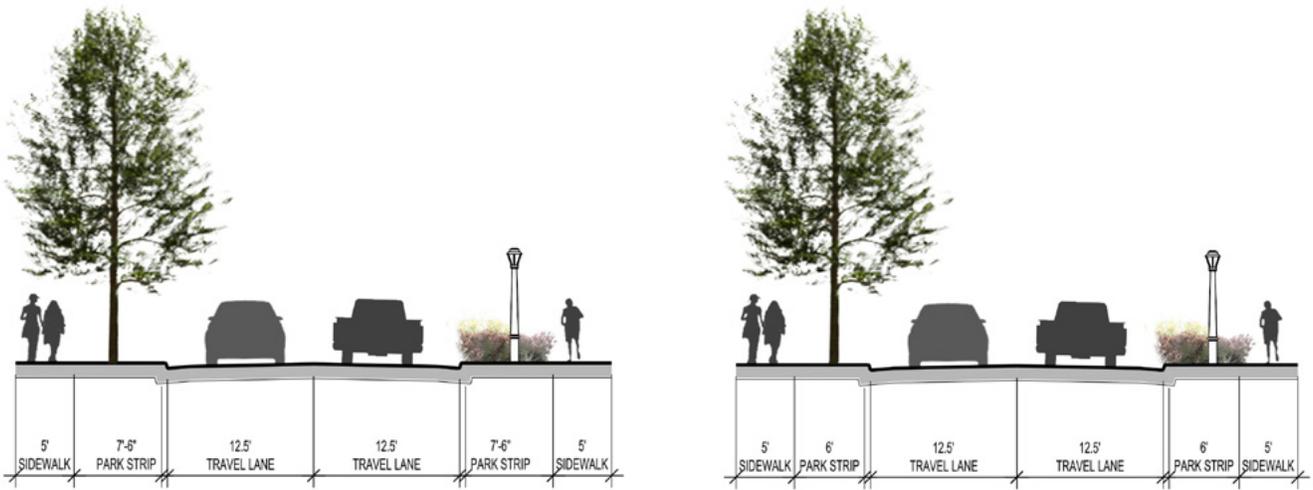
Standard residential street cross-section (A).* Figure 6.7. Standard residential street cross-section (B).
